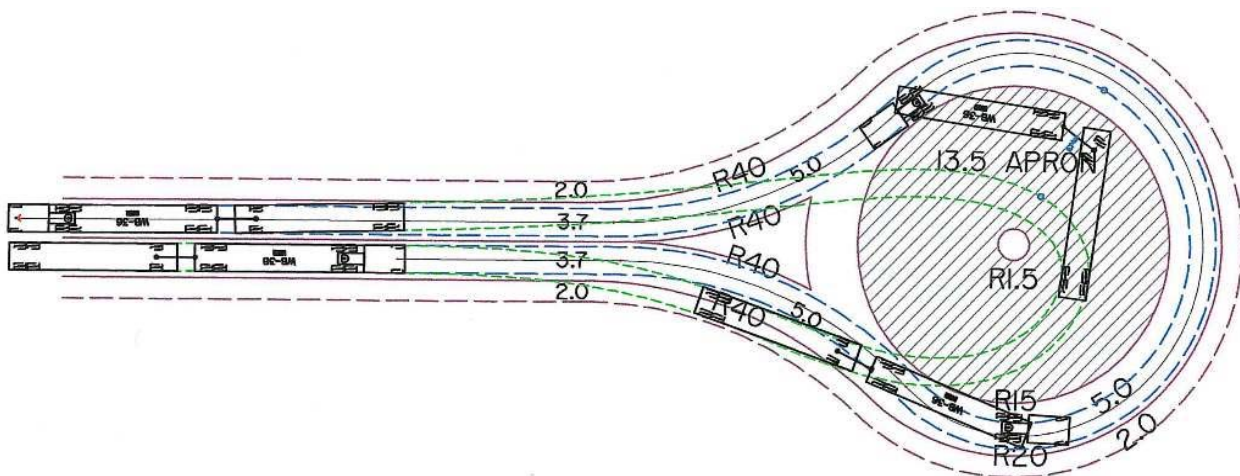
PROPOSED ROUNDABOUT FASTEST PATH
